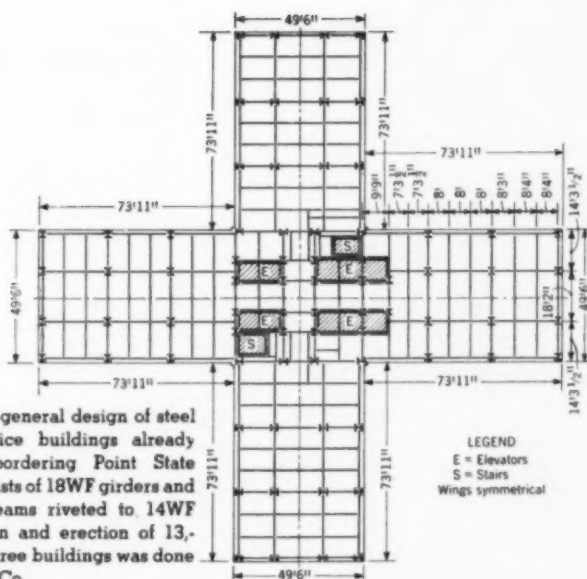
Plan shows general design of steel frame for three office buildings already erected on strip bordering Point State Park. Framing consists of 18WF girders and 10WF and 12WF beams riveted to 14WF columns. Fabrication and erection of 13,000 tons of steel for three buildings was done by American Bridge Co.
